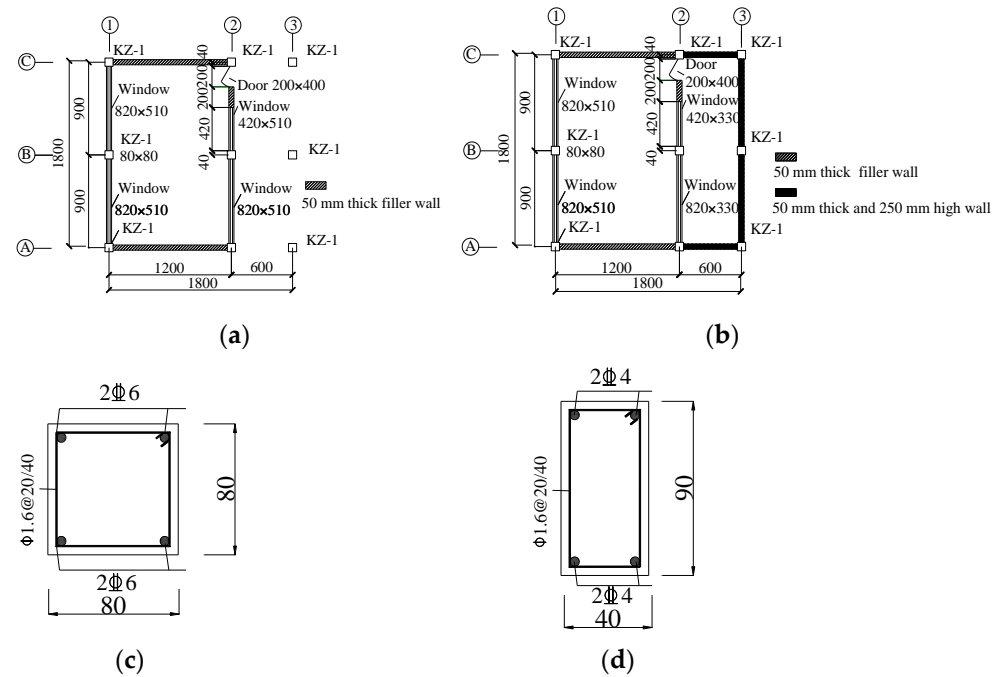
Shaking-table test model for four-story, infilled RC-planar-frame structure. (a) Plan view of first floor. (b) Plan view of other floors. (c) Reinforcement of column. (d) Reinforcement of beam.
